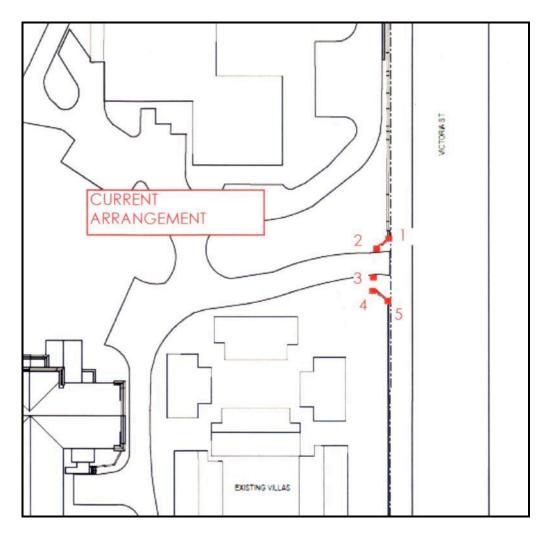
Extract of Site Plan showing current arrangement of Gate Piers 1-5, in red. (Source: EPM Projects)
